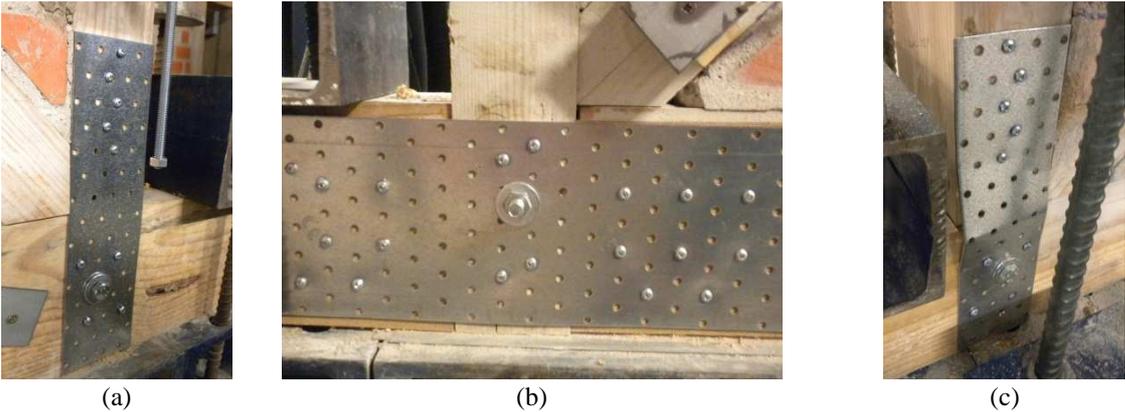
Strengthening of base with steel plates: (a) front side vertical separation; (b) back side horizontal separation; (c) deformation of steel plate after test
